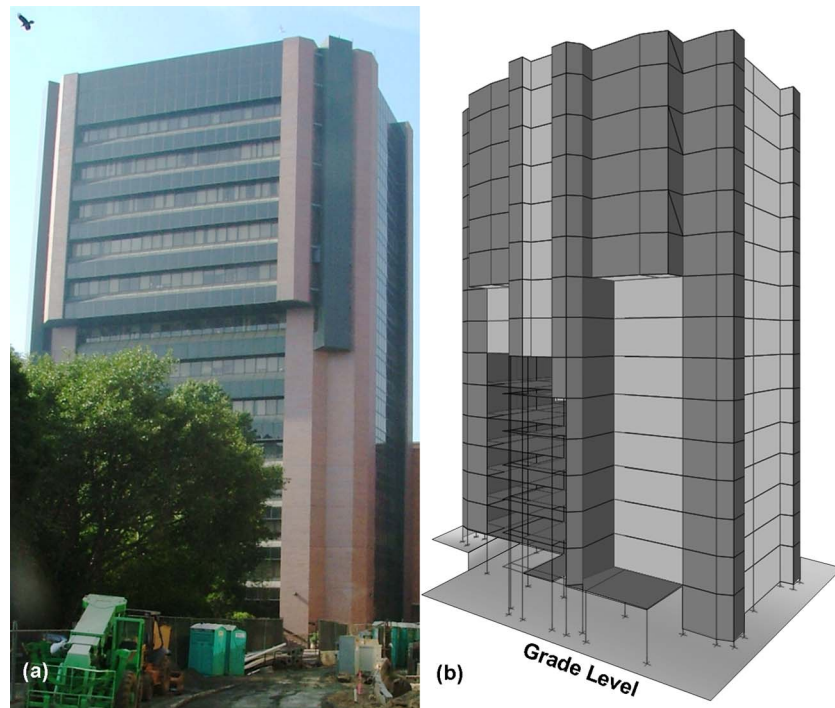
(a) Louis Factor Building showing east face, and (b) finite element model of the building showing west face.
